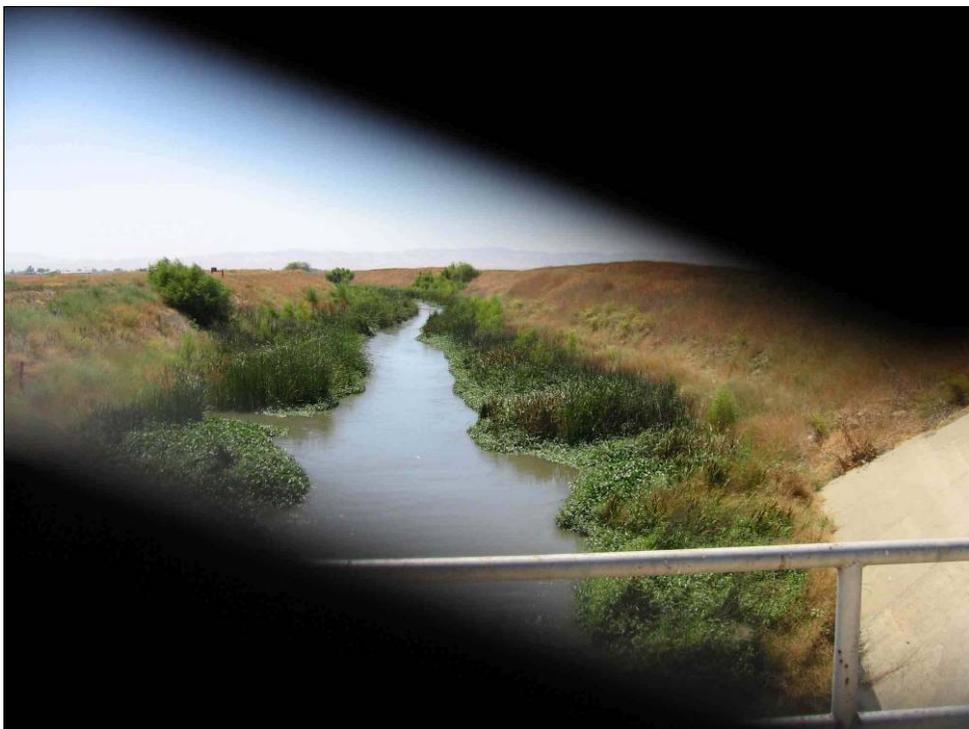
15B Wasteway Upstream of Treatment Pond Bridge
